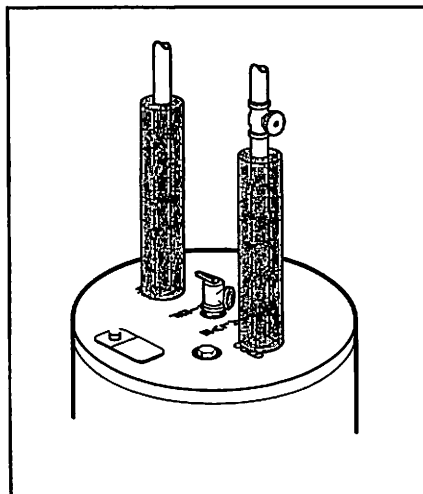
Typical Vertical piping arrangement. (Your installation may vary slightly.)
